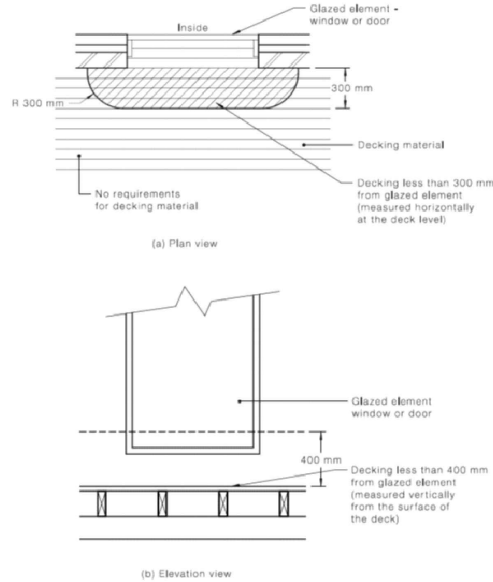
DECKING WITHIN HORIZONTAL AND VERTICAL LIMITS OF GLAZED ELEMENTS
